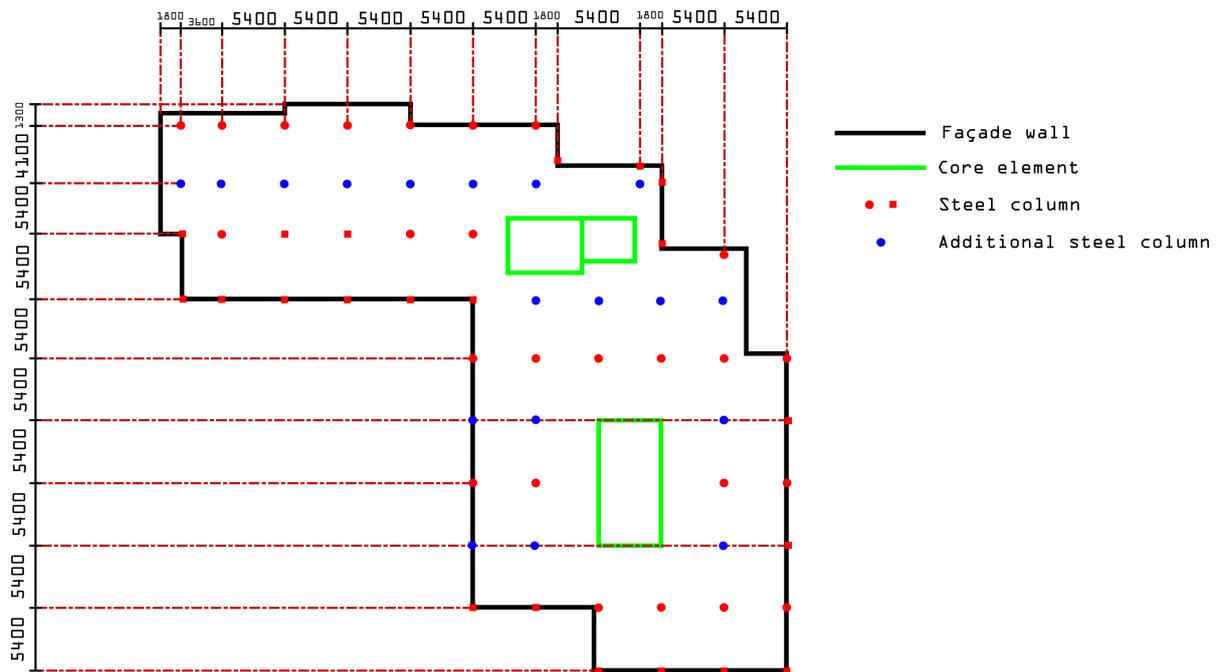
Floor Plan Apollolaan 171 with Additional Columns - First Floor
